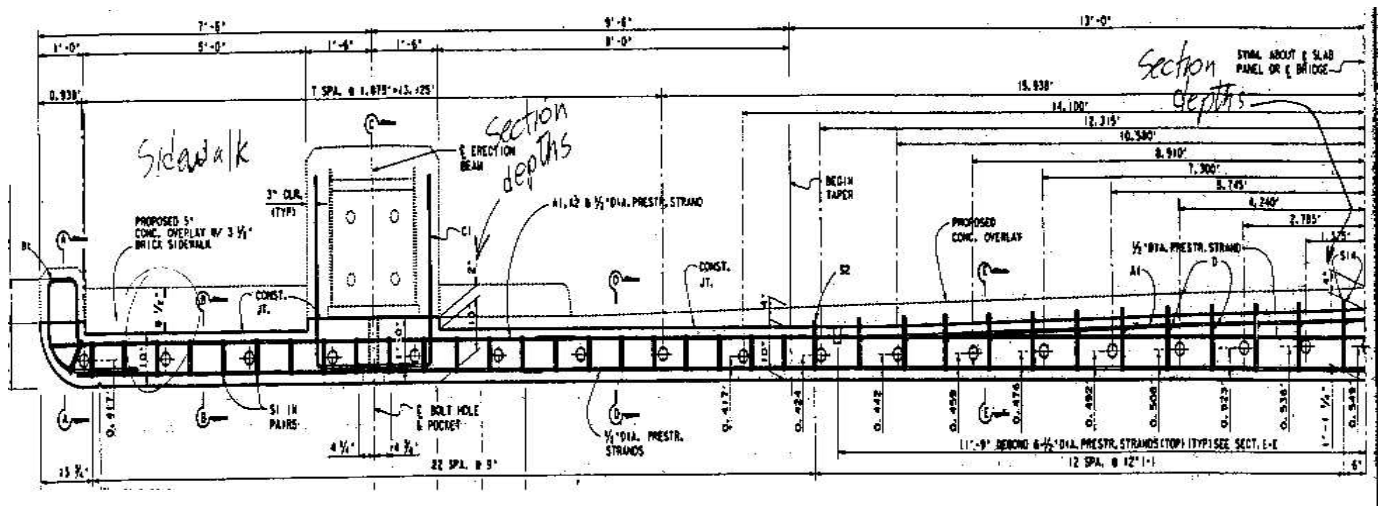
Half cross section of the arch tied bridge
